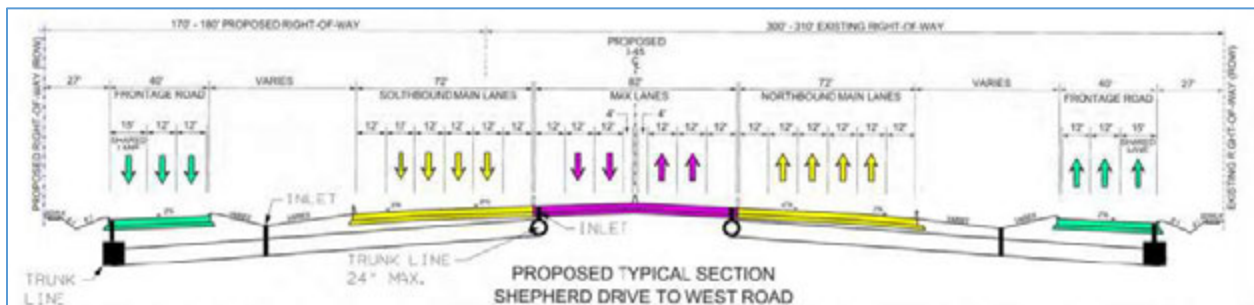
Proposed Typical Section from South of Shepherd Drive to South of West Road
